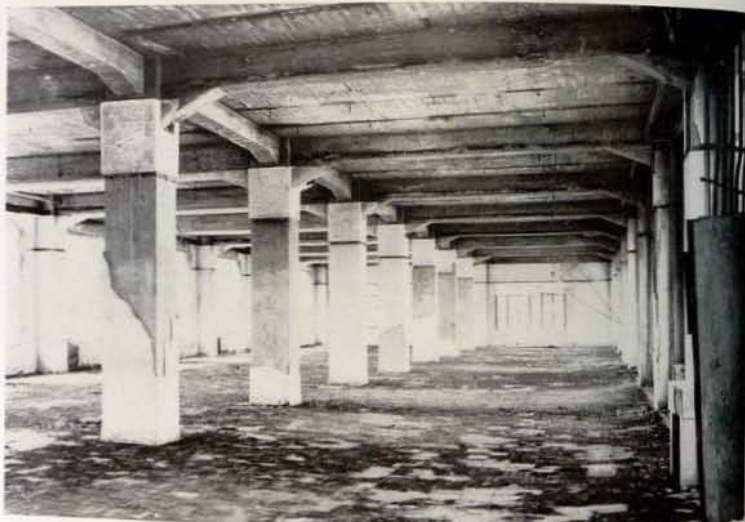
3,900 feet from GZ. Group 4. Building 28, third floor looking west.
